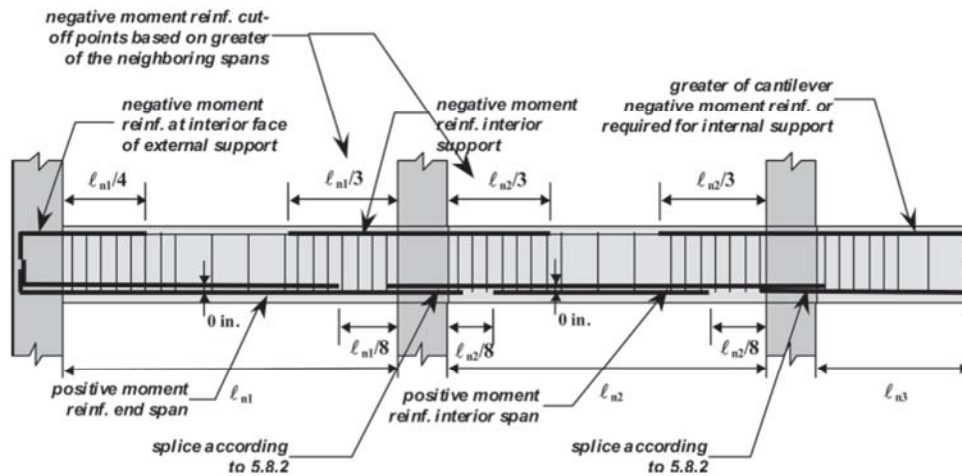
Reinforcement in girders that are part of a moment-resisting frame supported by columns or reinforced concrete walls.
